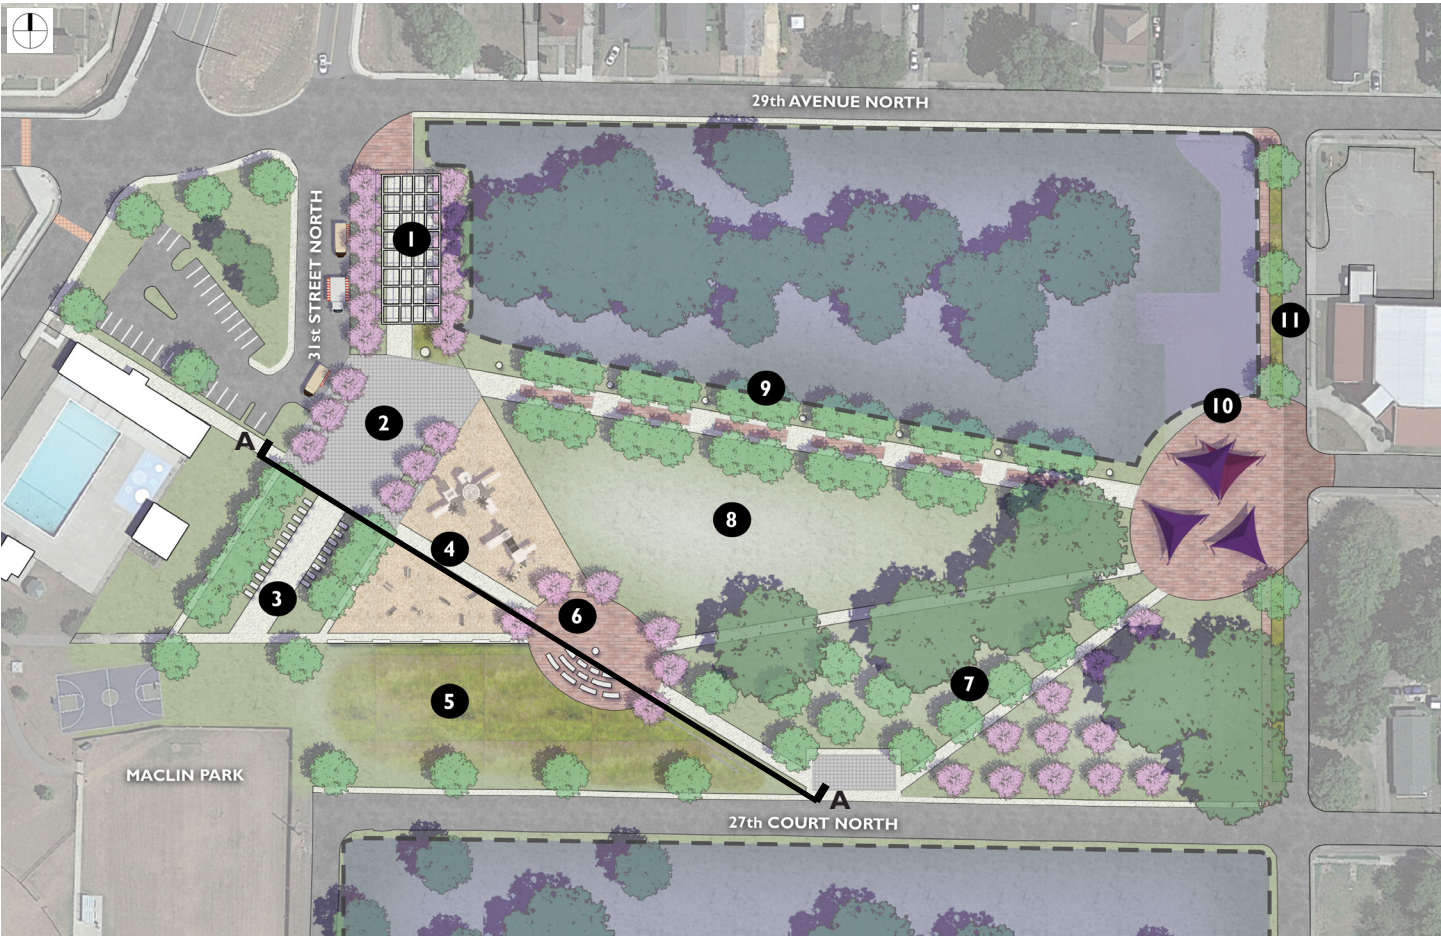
Shuttlesworth Civil Rights Park Concept Master Plan
